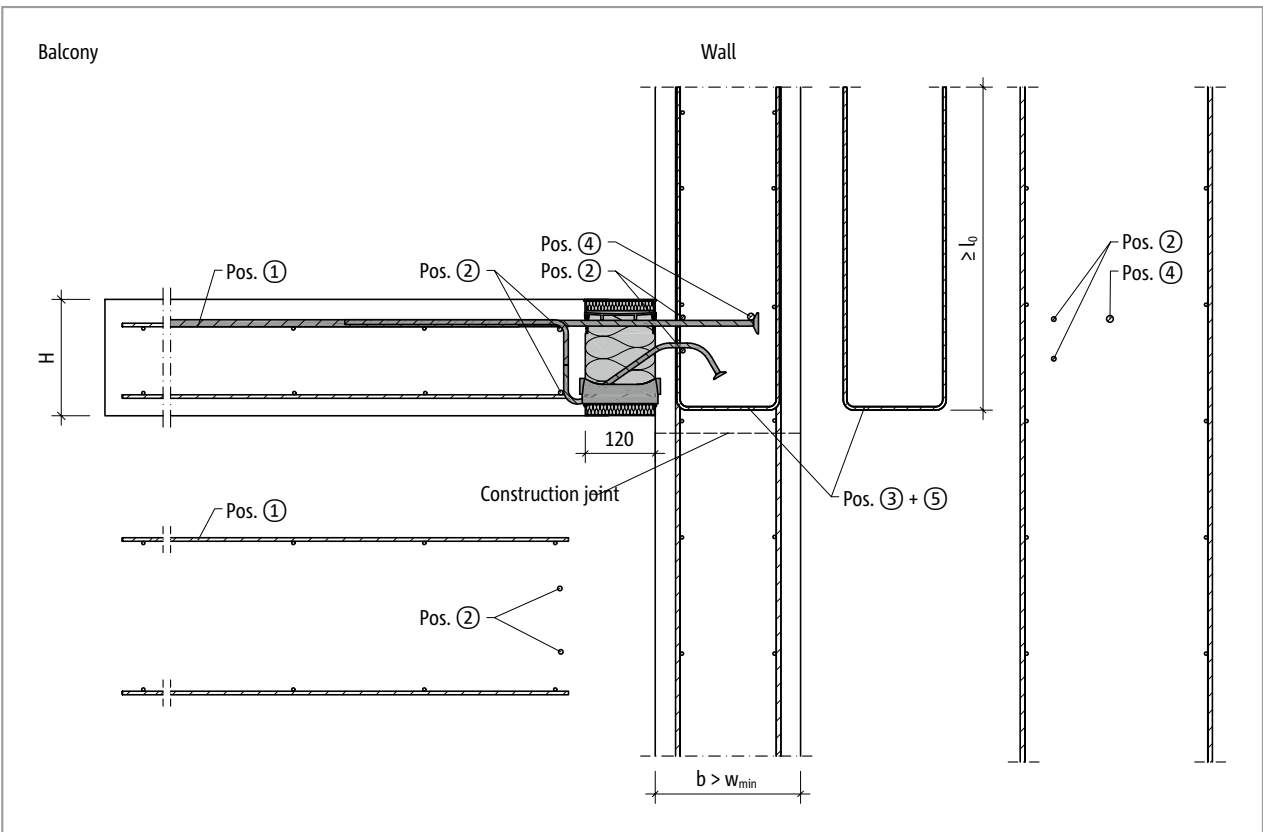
Schöck Isokorb® XT type K-U: On-site reinforcement for wall connection upwards with larger structural element dimension ( $w_{vorh} > w_{min}$ )
